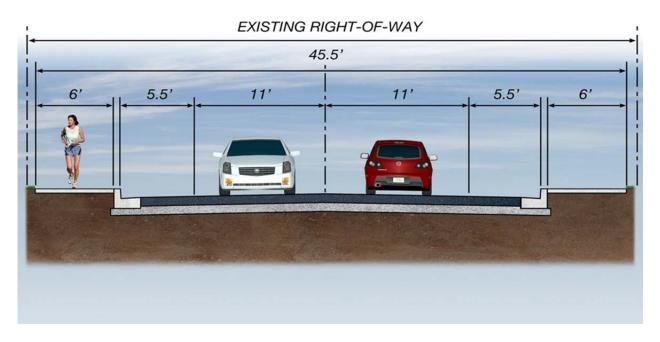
Proposed Roadway Section East of Proposed Movable Bridge
